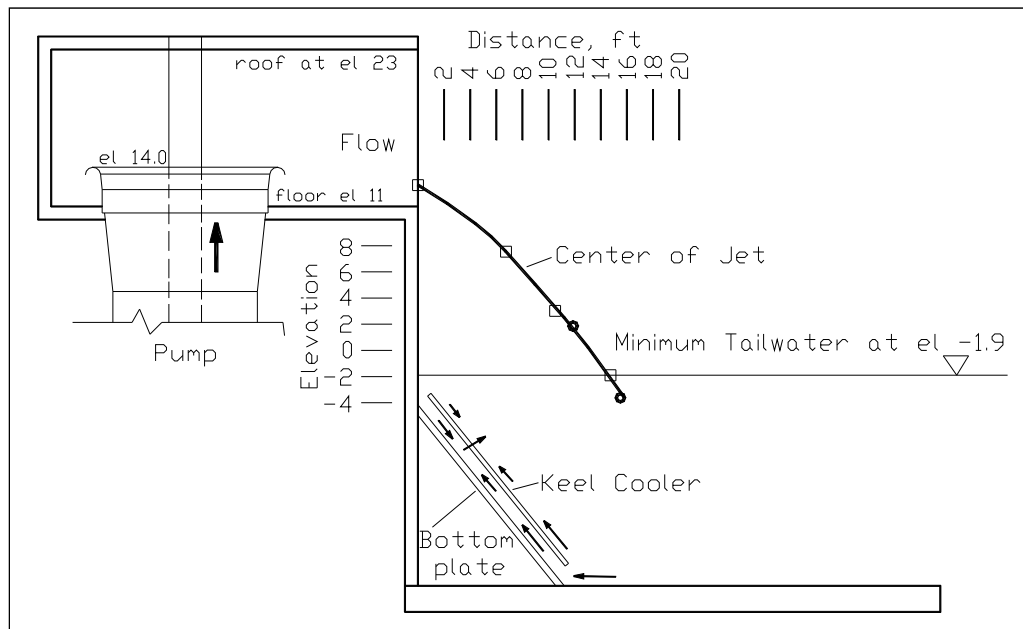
Schematic of flow patterns with sloped keel cooler having bottom plate.
